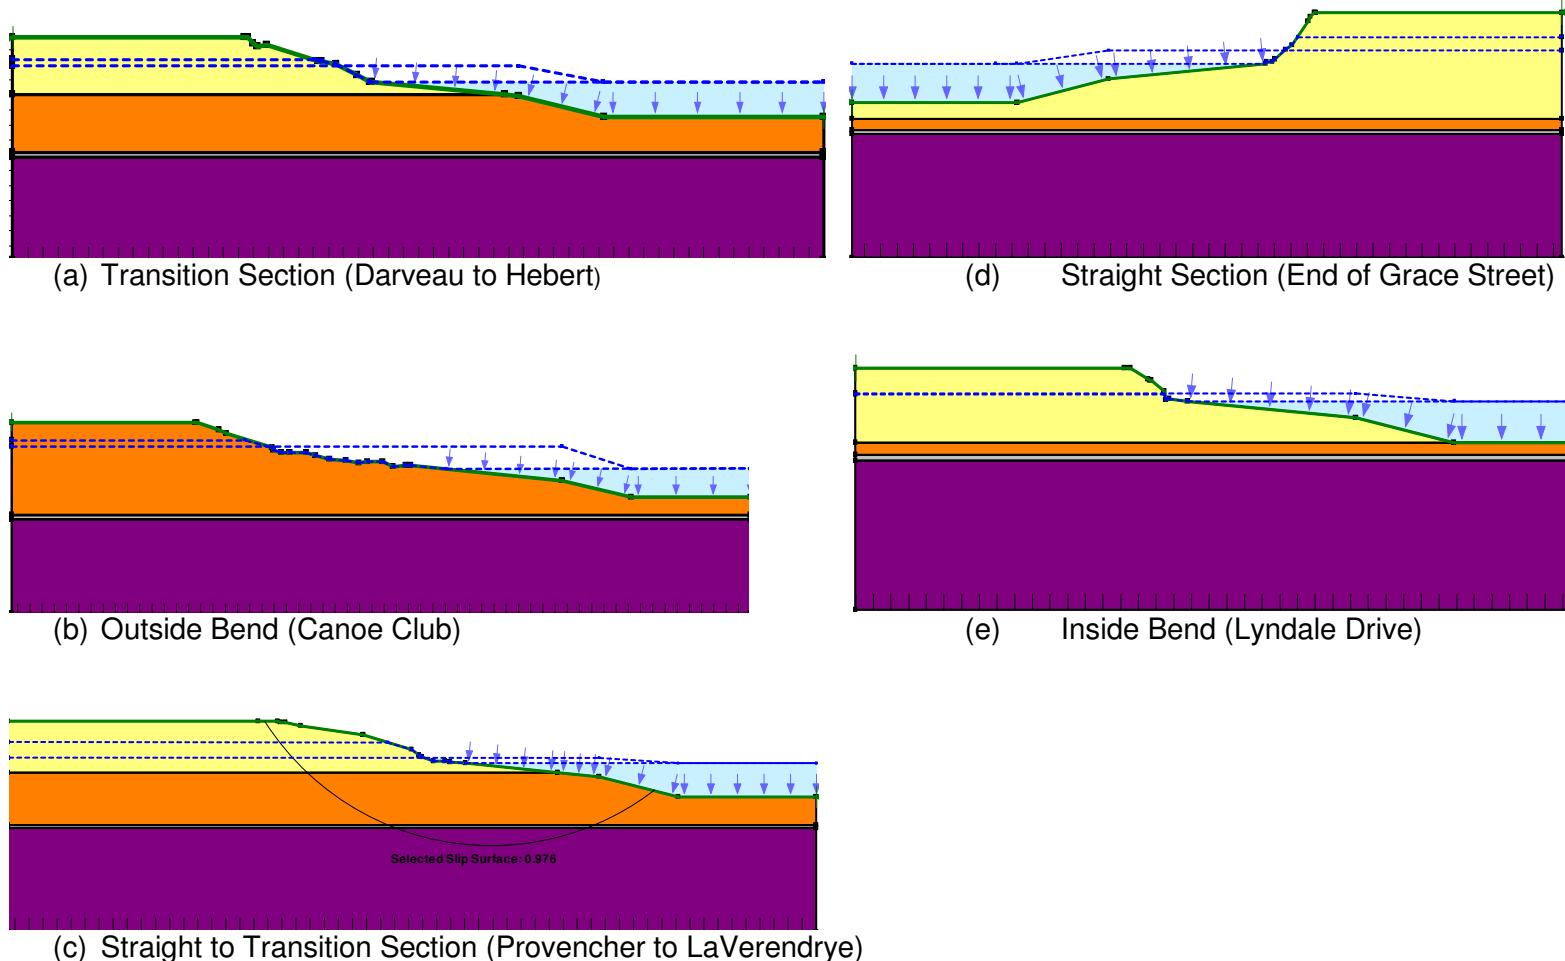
Model Cross Sections for (a) Transition Section, (b) Outside Bend, (c) Straight to Transition Section, (d) Straight Section and (e) Inside Bend.
